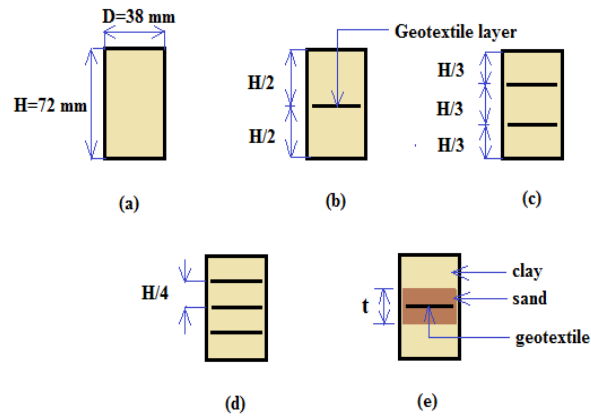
Arrangement of geotextile layers in reinforced soil (a) Plane soil (b) Soil specimen with one-layer geotextile (c) Soil specimen with two-layer geotextile (d) Soil specimen with three-layer geotextile (e) sandwich specimen
